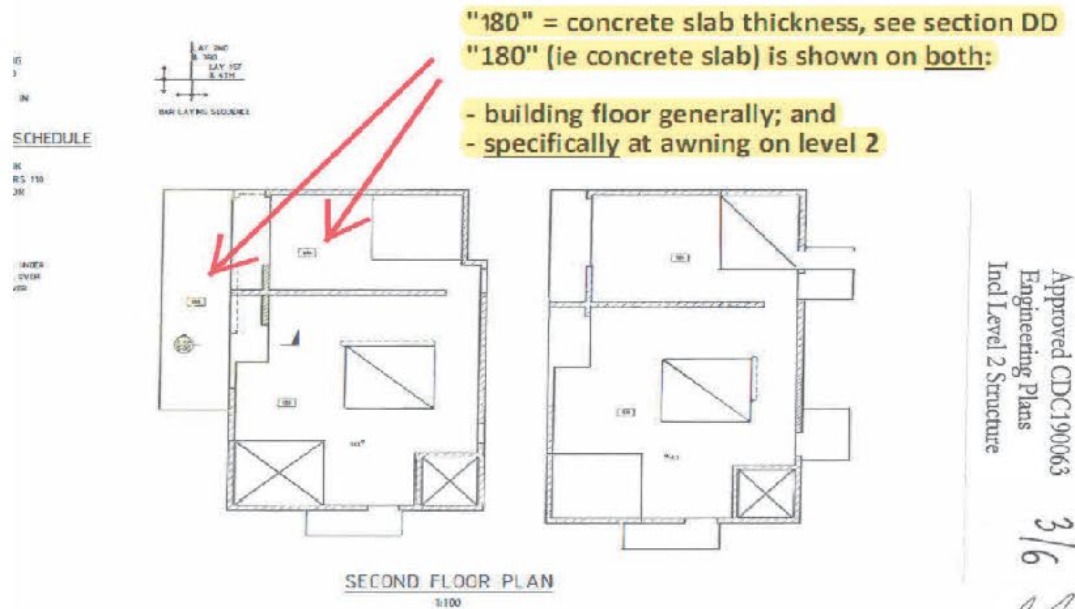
Approved CDC2019/0461 Engineering Plan No. S04 - Second Floor Plan with Applicant mark up
